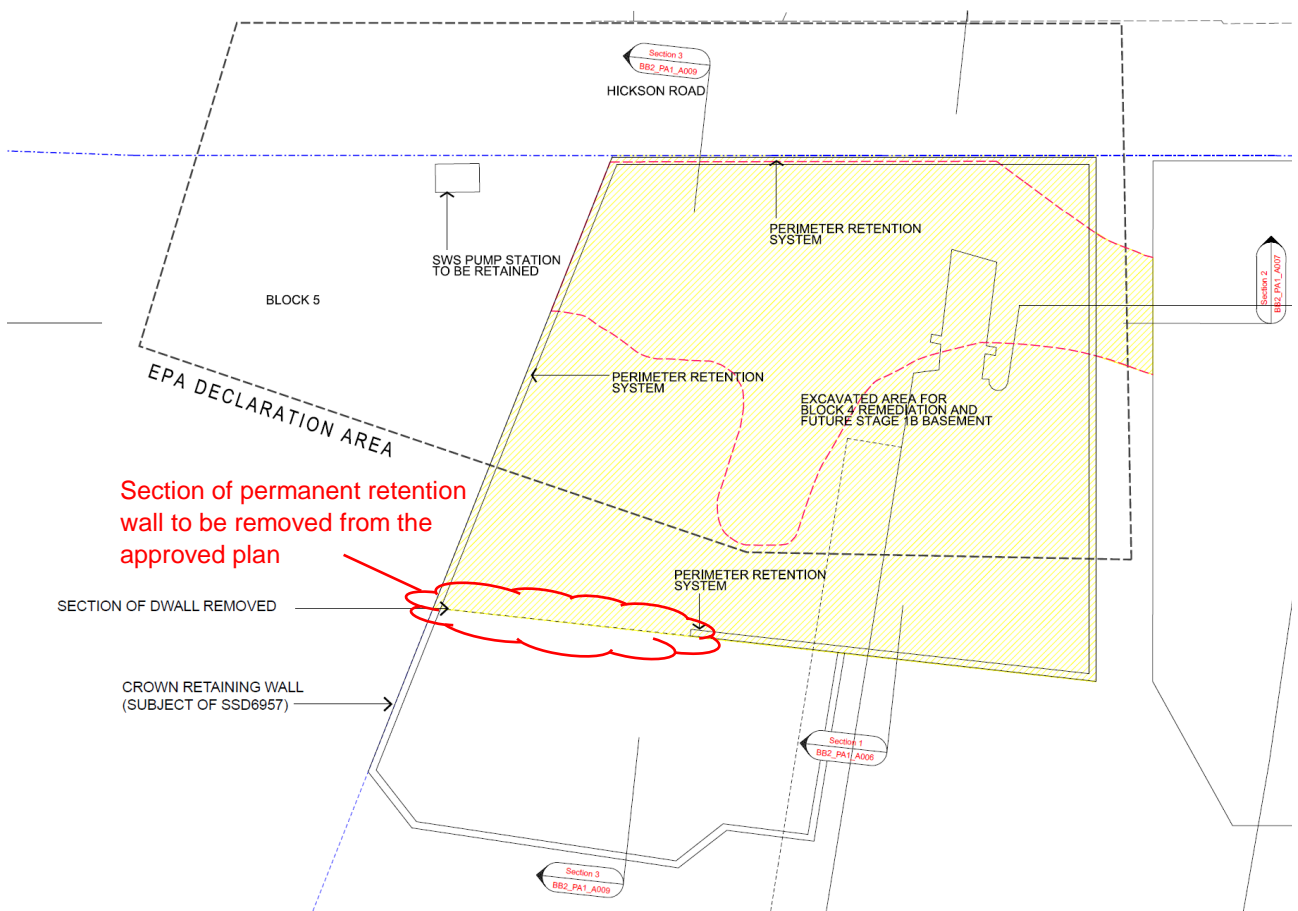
Block 4 perimeter retention wall as it is proposed to be modified
